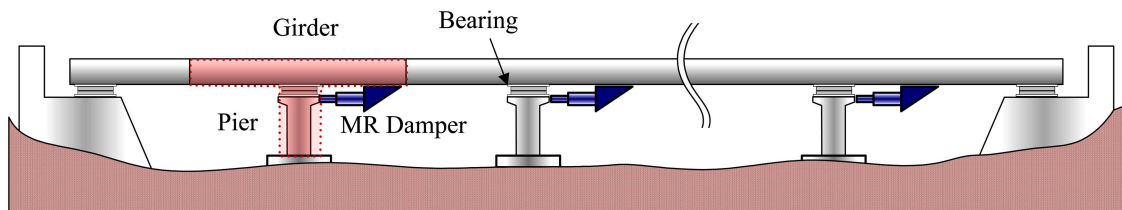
Bridge model connected by dampers at the connection between girder and pier.
